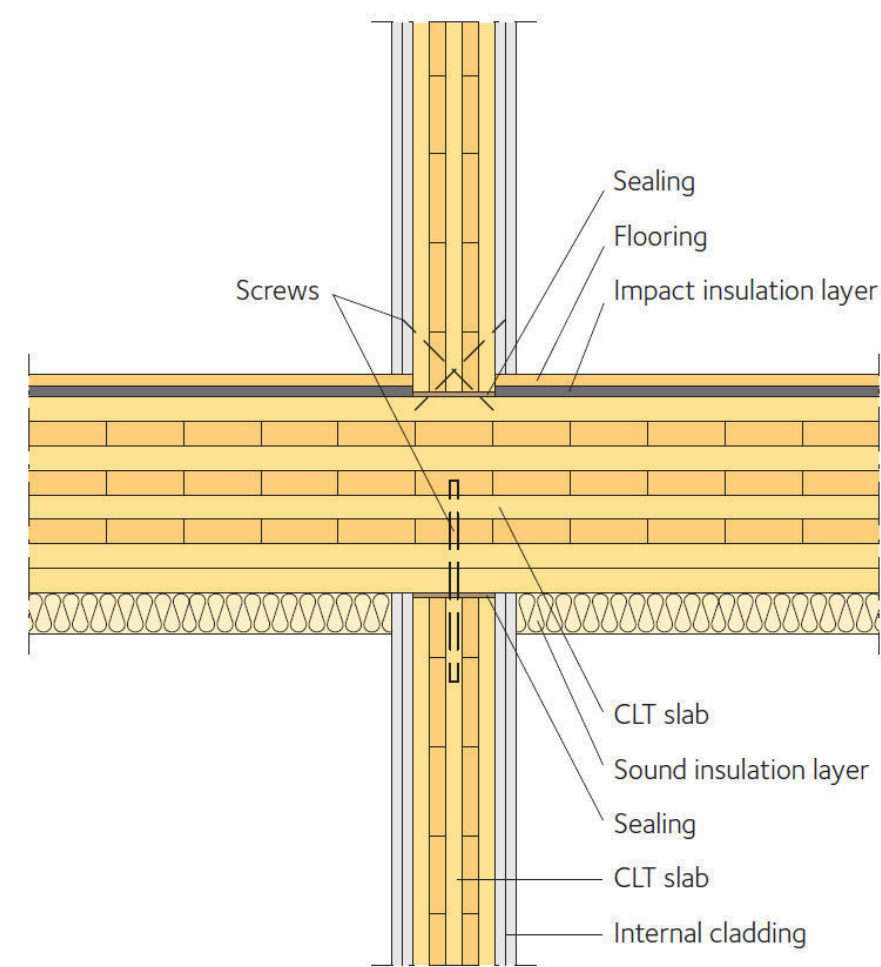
Vertical section for building without higher requirements, premises, regarding sound insulation. Joint flooring to bearing inner wall.
